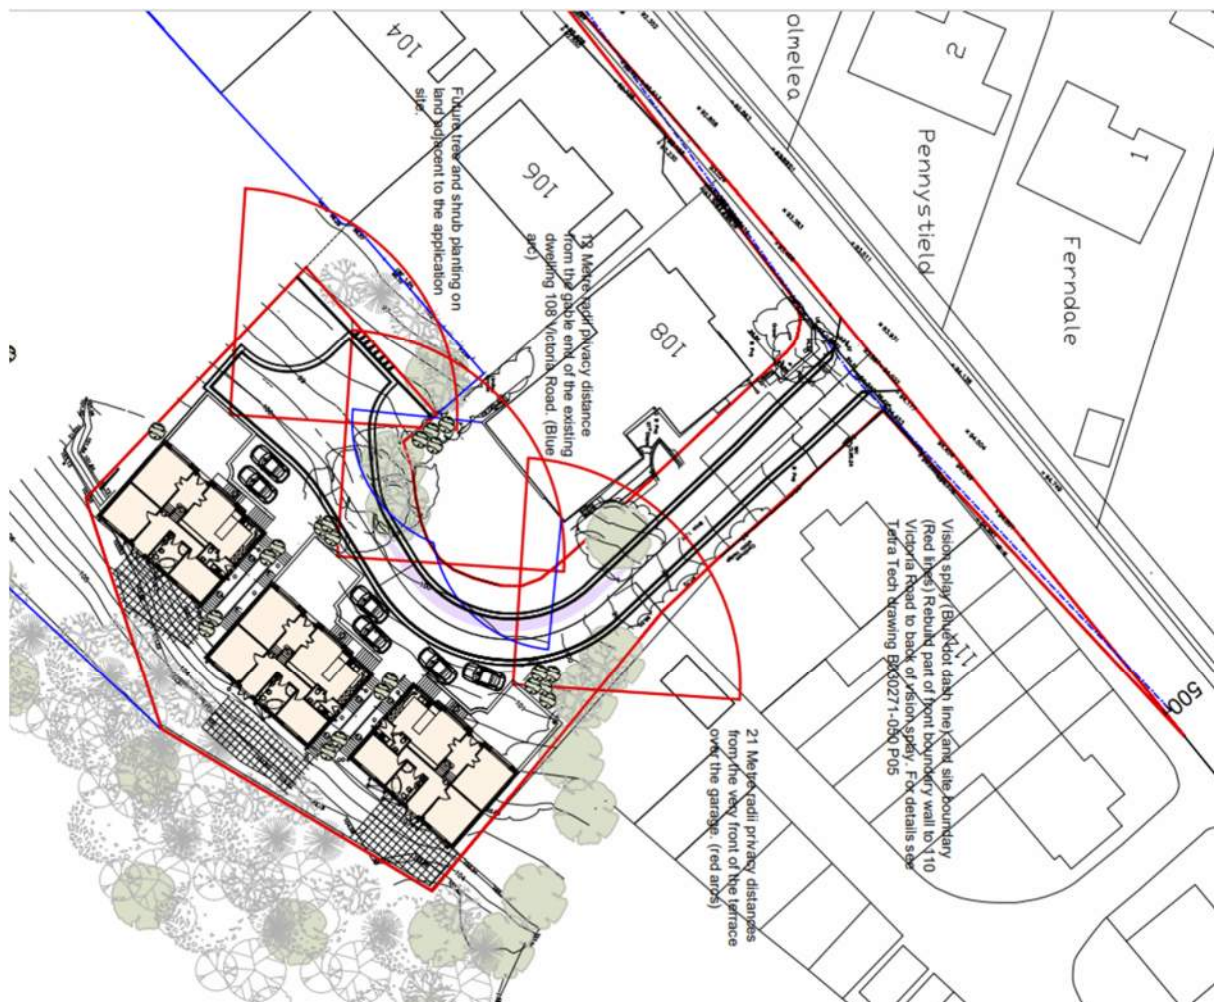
Extract from the submitted layout plans for the Technical Details Consent (TDC) application (4/23/2164/PIP)
